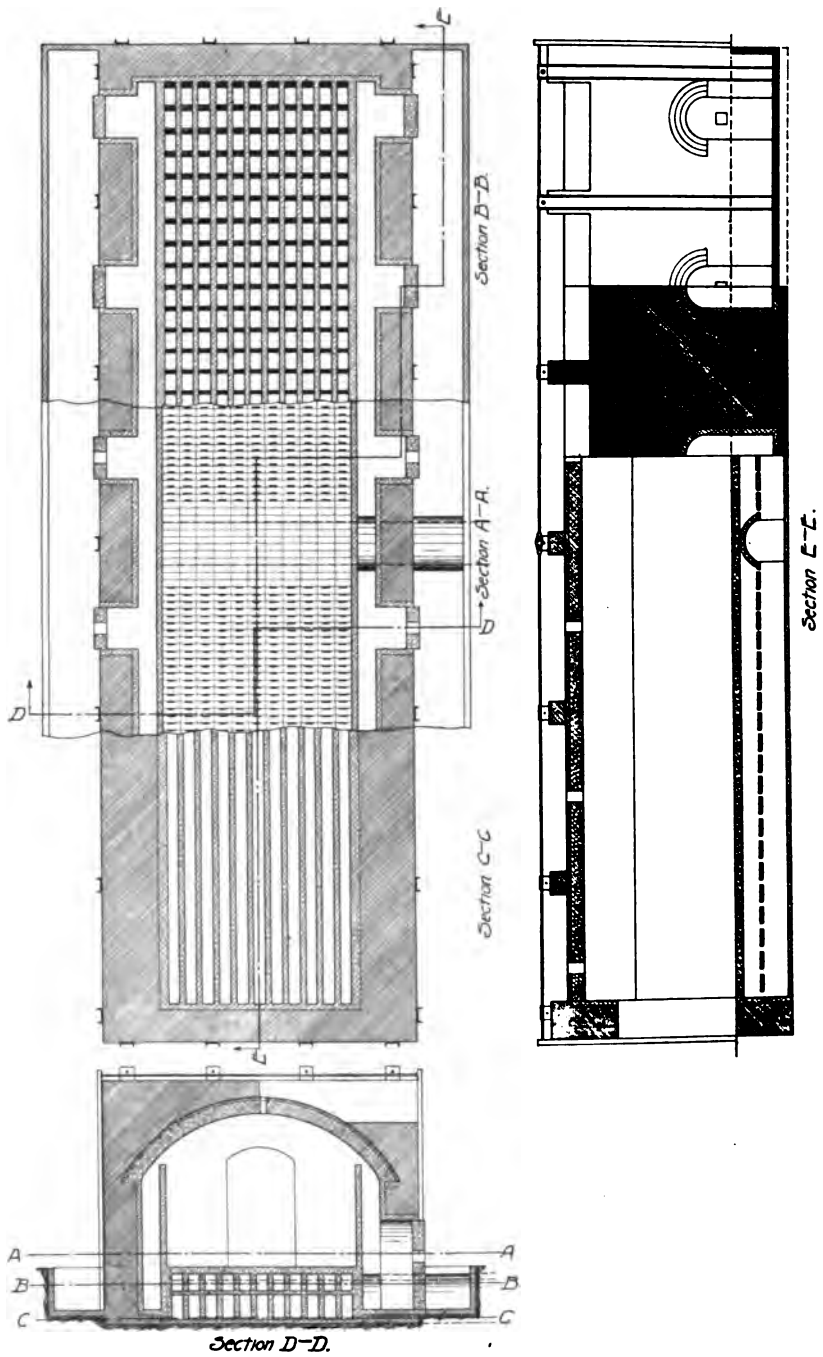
Mitchell Kiln in Use at Detroit Roofing Tile Co., Detroit, Mich.
